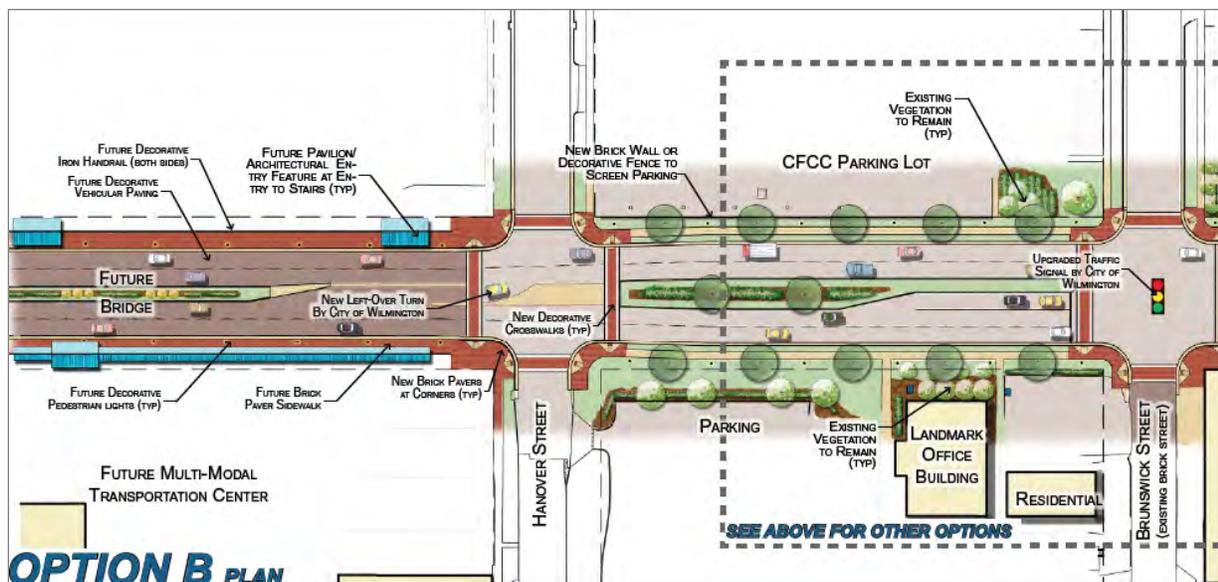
Design Concept for North 3rd Street Streetscape Improvements (Kimley-Horn/URS)
